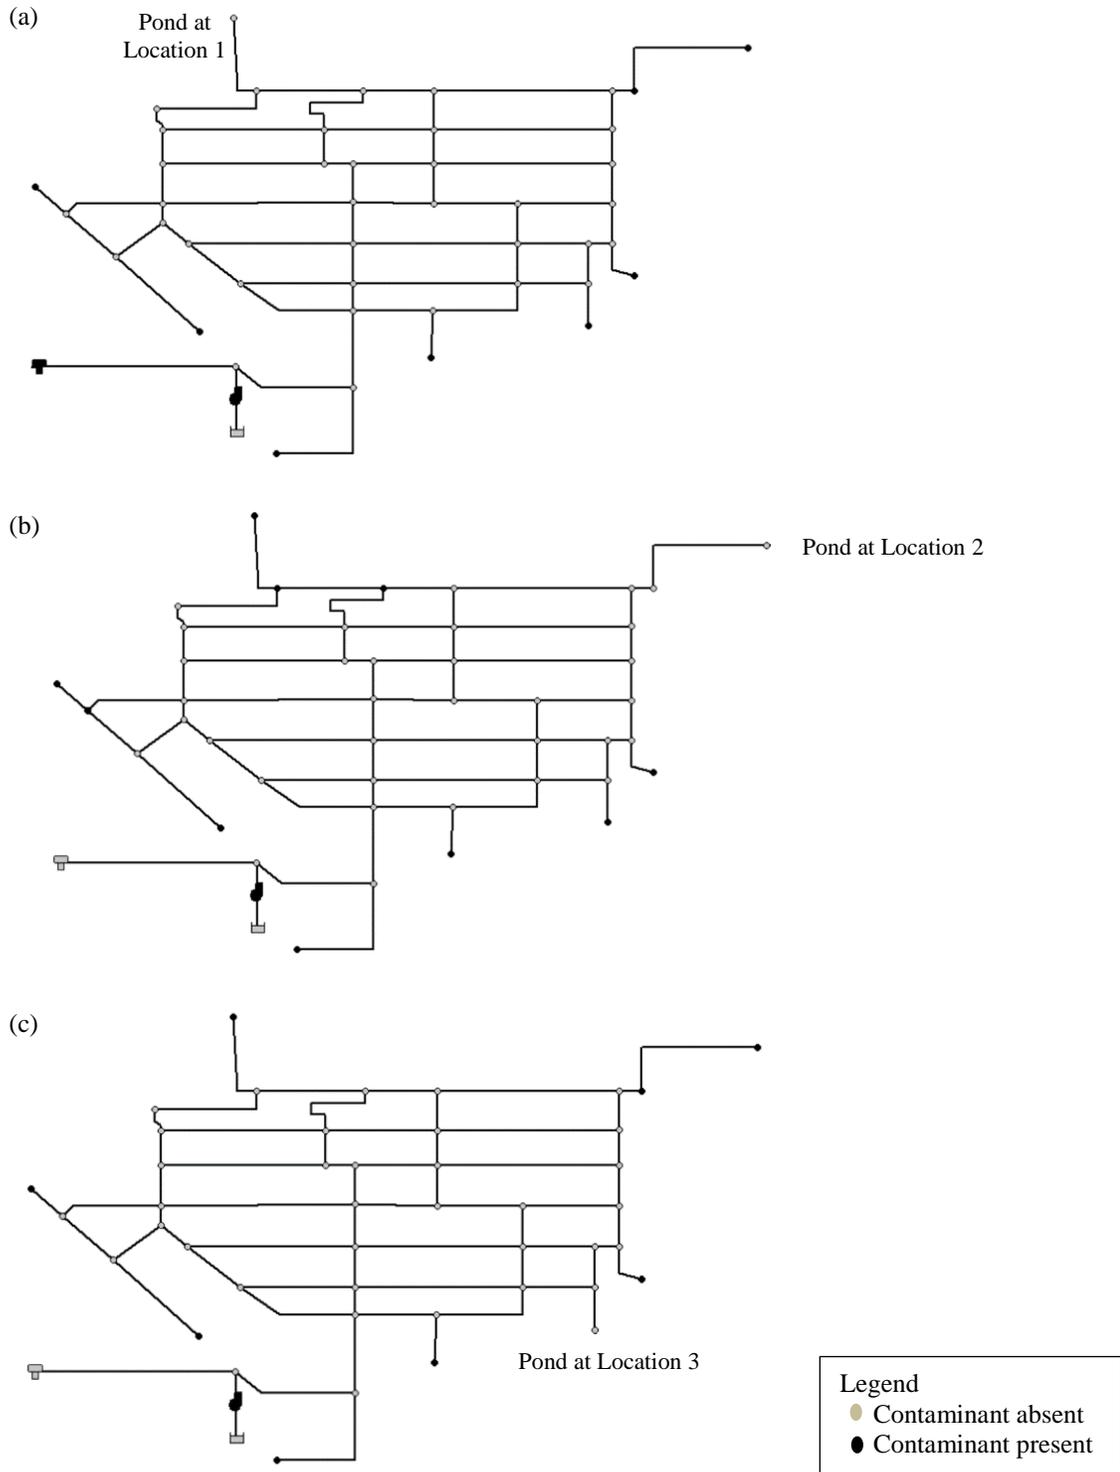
System B at pond maximum capacity for the pond at (a) Pond Location 1, (b) Pond Location 2 and (c) Pond Location 3.
